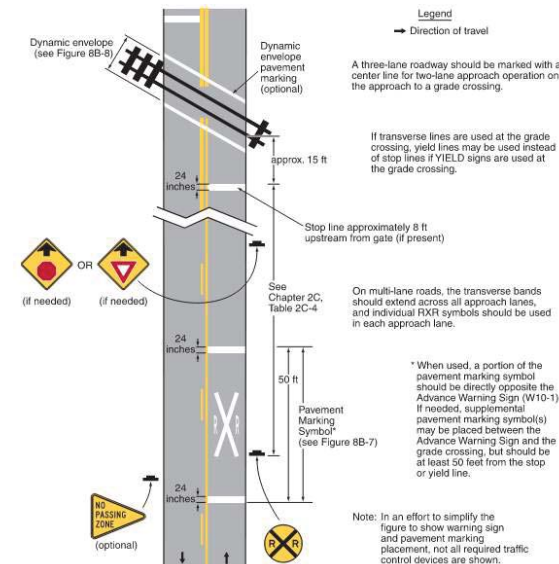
Example Pavement Marking and Signing (per MUTCD)
